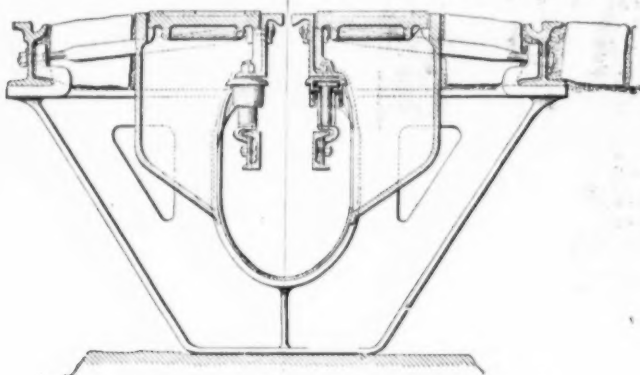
SECTION OF CONDUIT—INSULATOR SUSPENSION.
